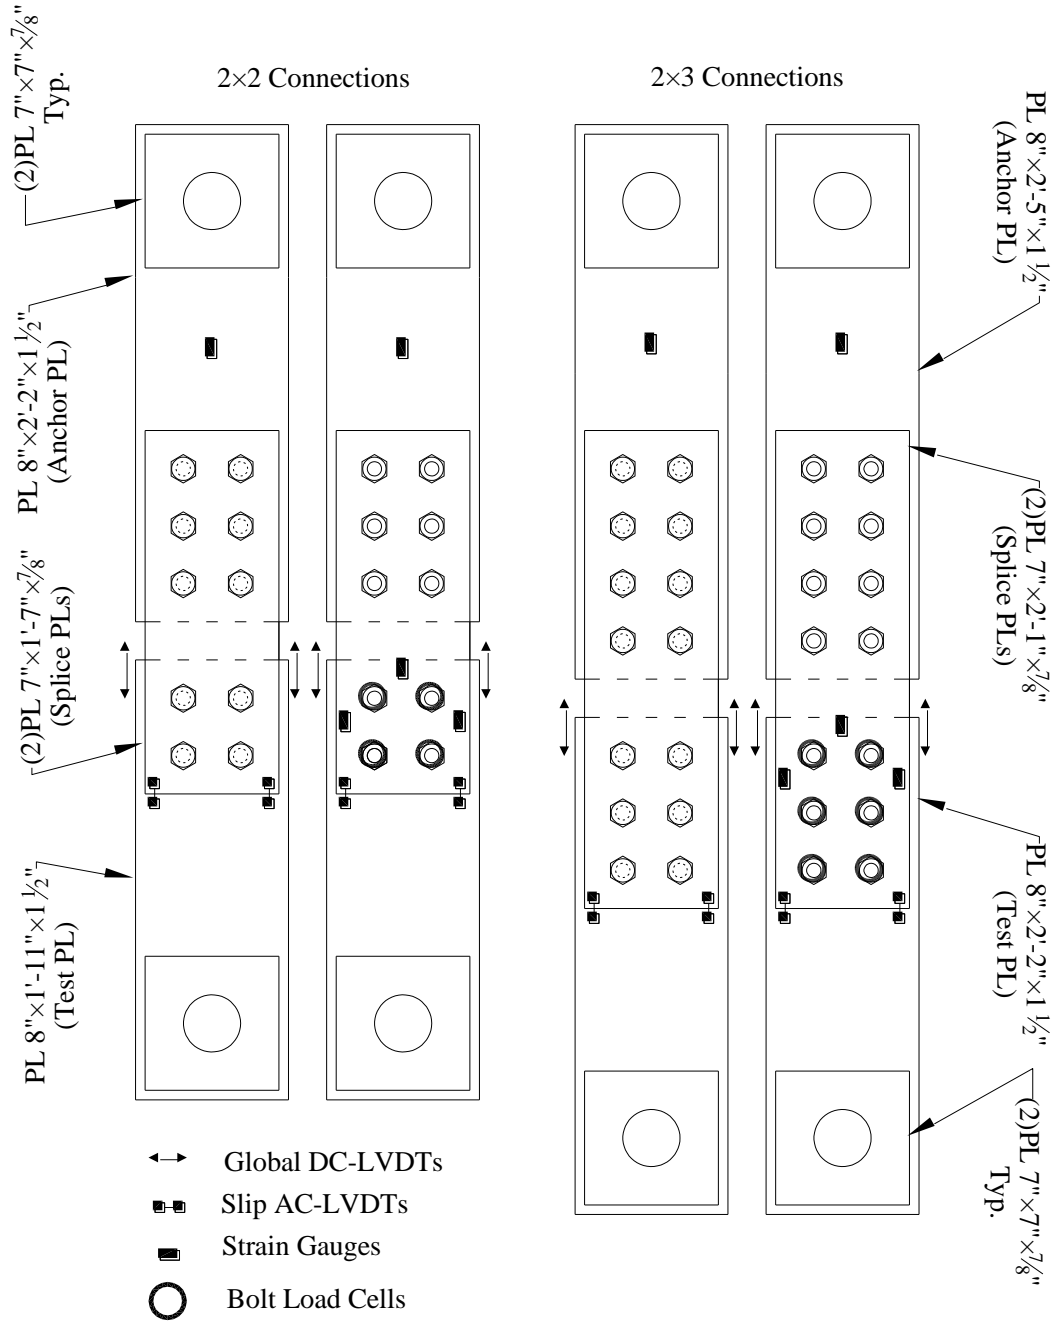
Details and instrumentation layout of 2x2 and 2x3 specimens.
